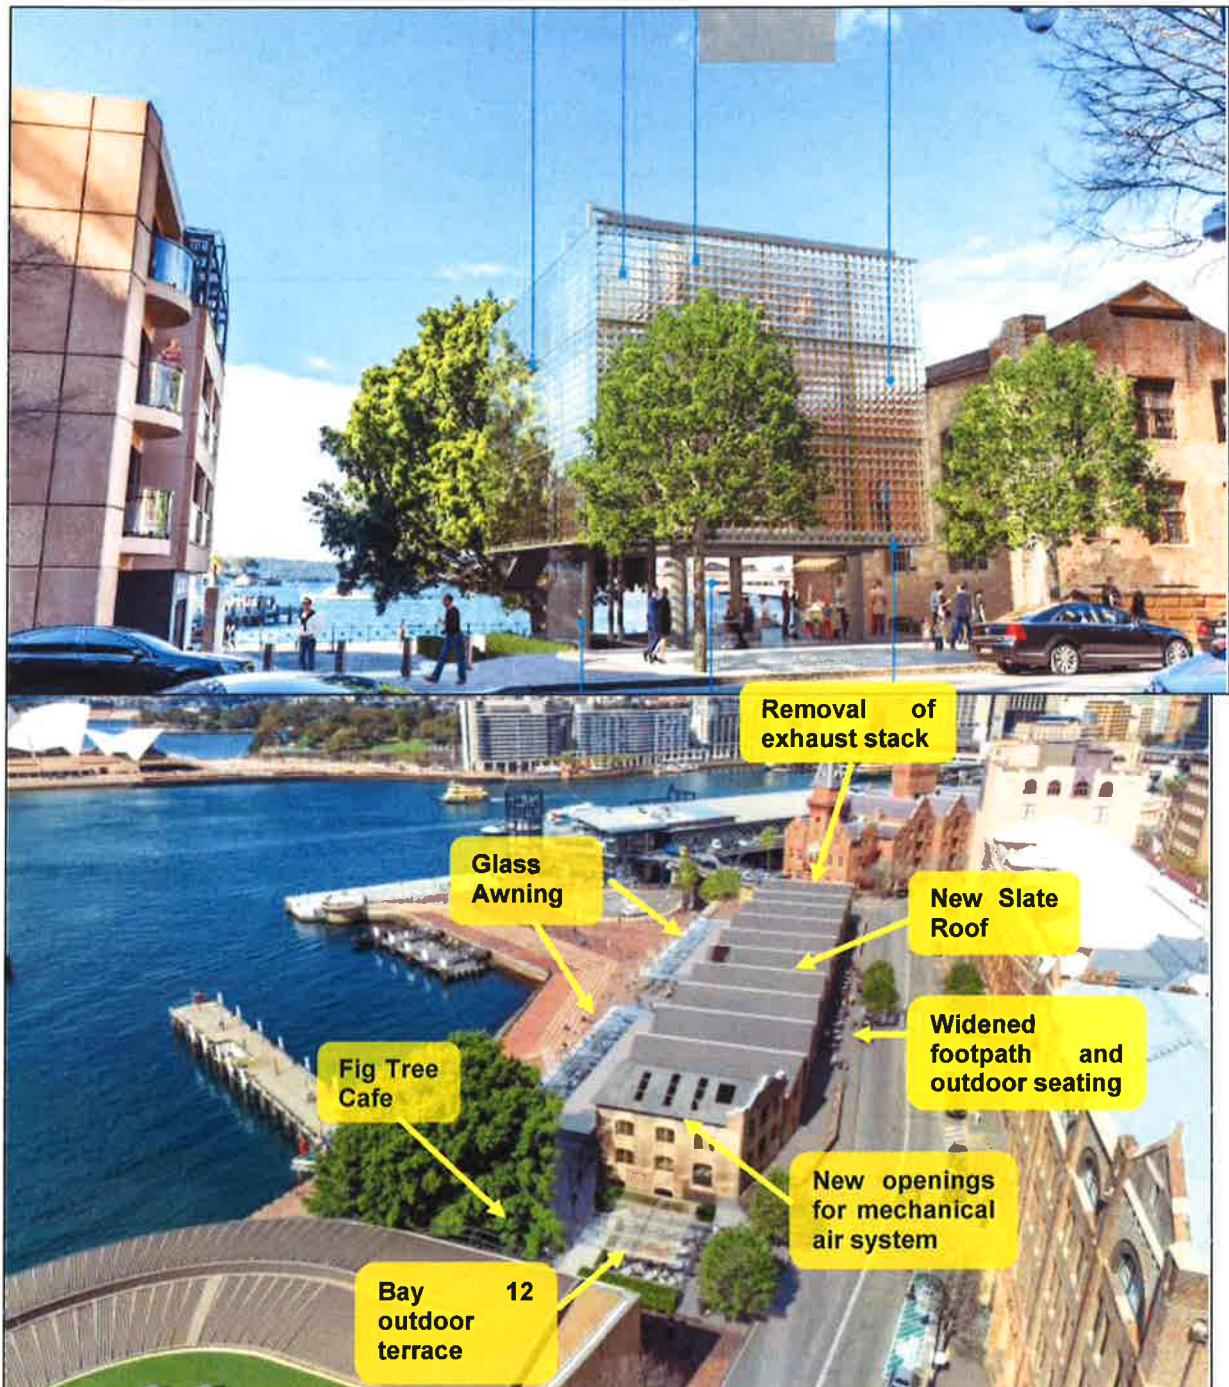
The proposed alterations and additions to Campbell's Stores, including the Bay 12 outdoor terrace looking to the south (Source: Applicant's revised RTS).
